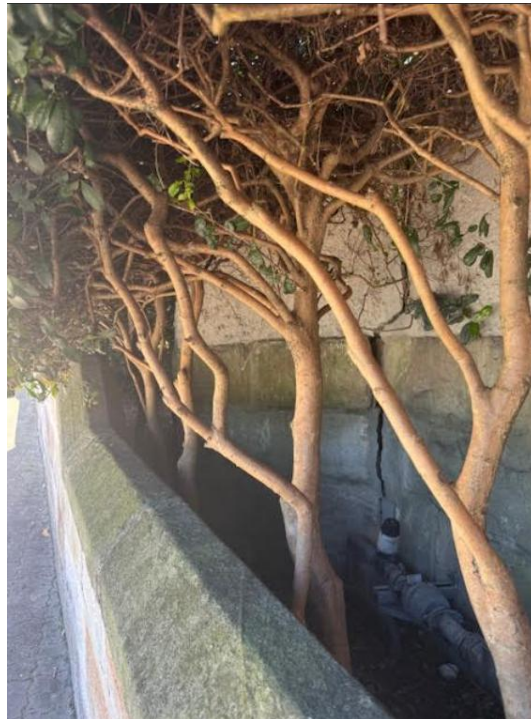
& 4. Photo of the bay window, vegetation and lower wall (April 2025)
